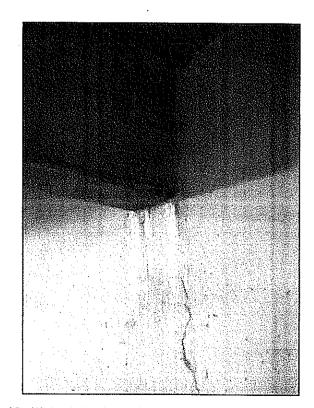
Water intrusion at beam-wall connection (wall cracking)
